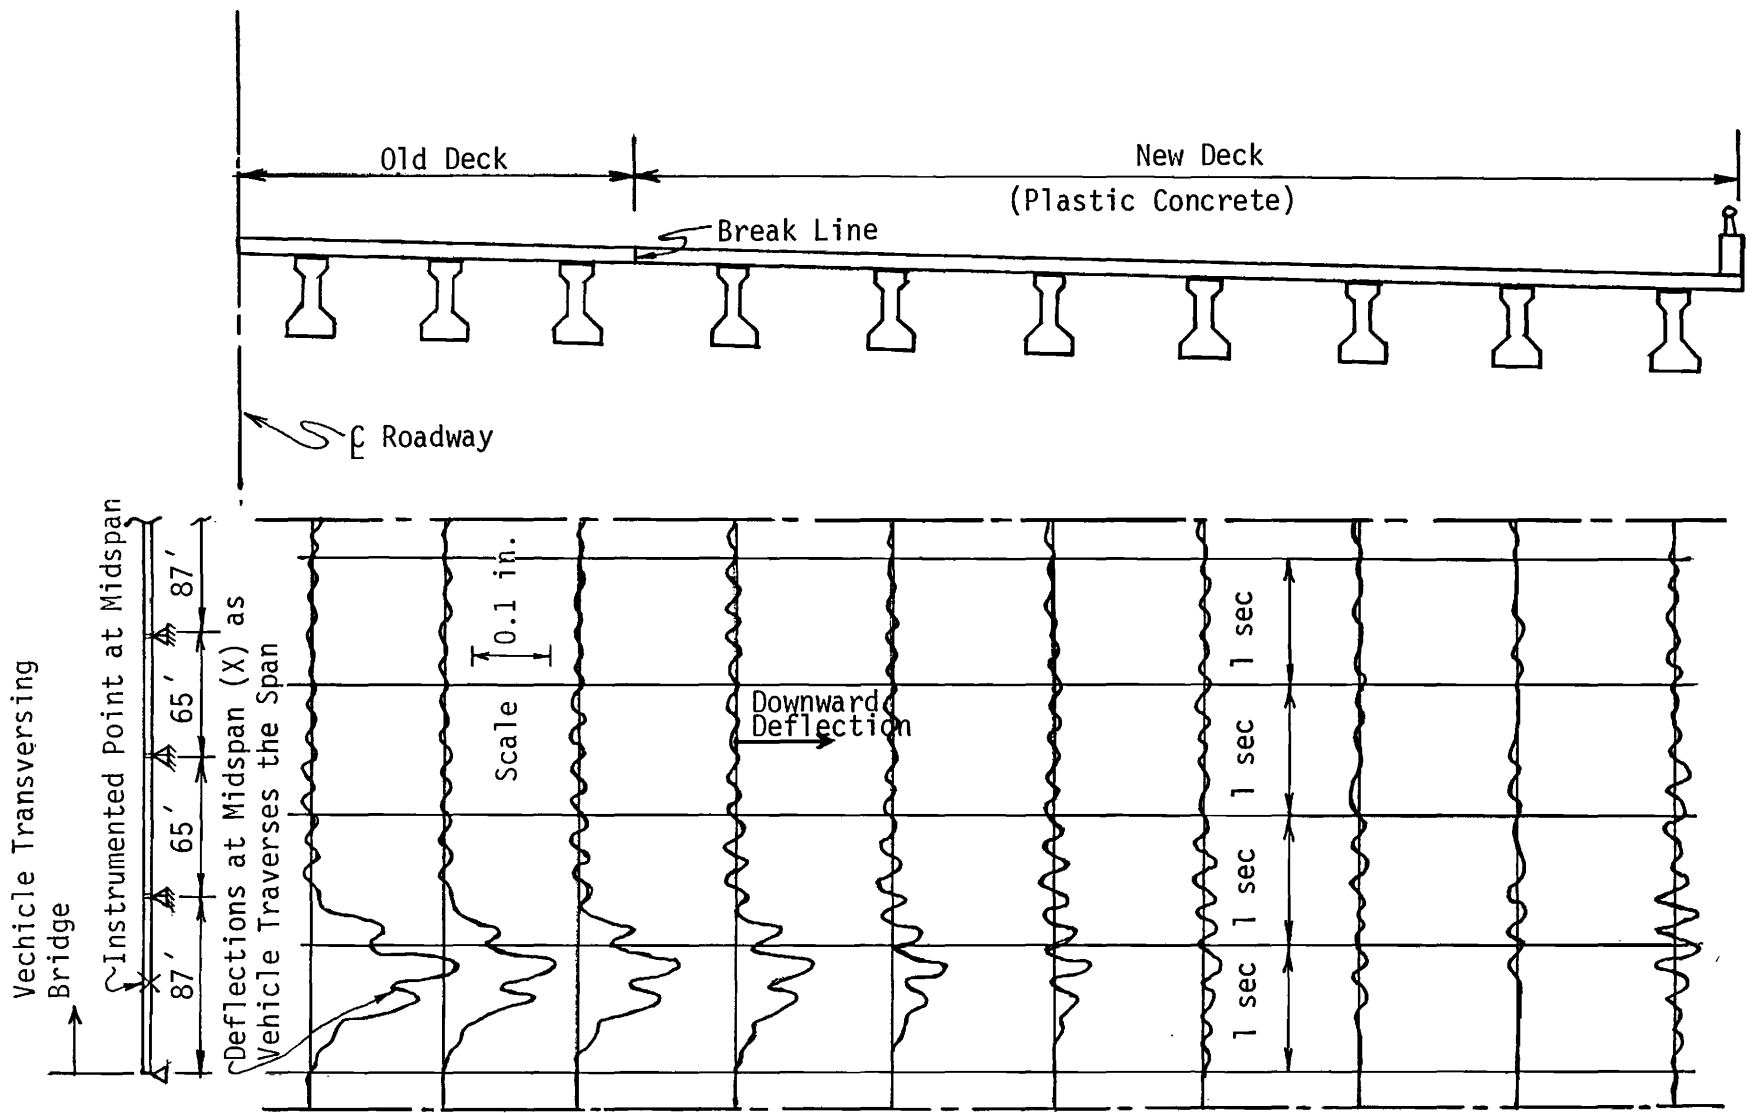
a. I-10 & Dell Dale Ave., Houston, Midspan Deflections of Beams due to One Crossing.
